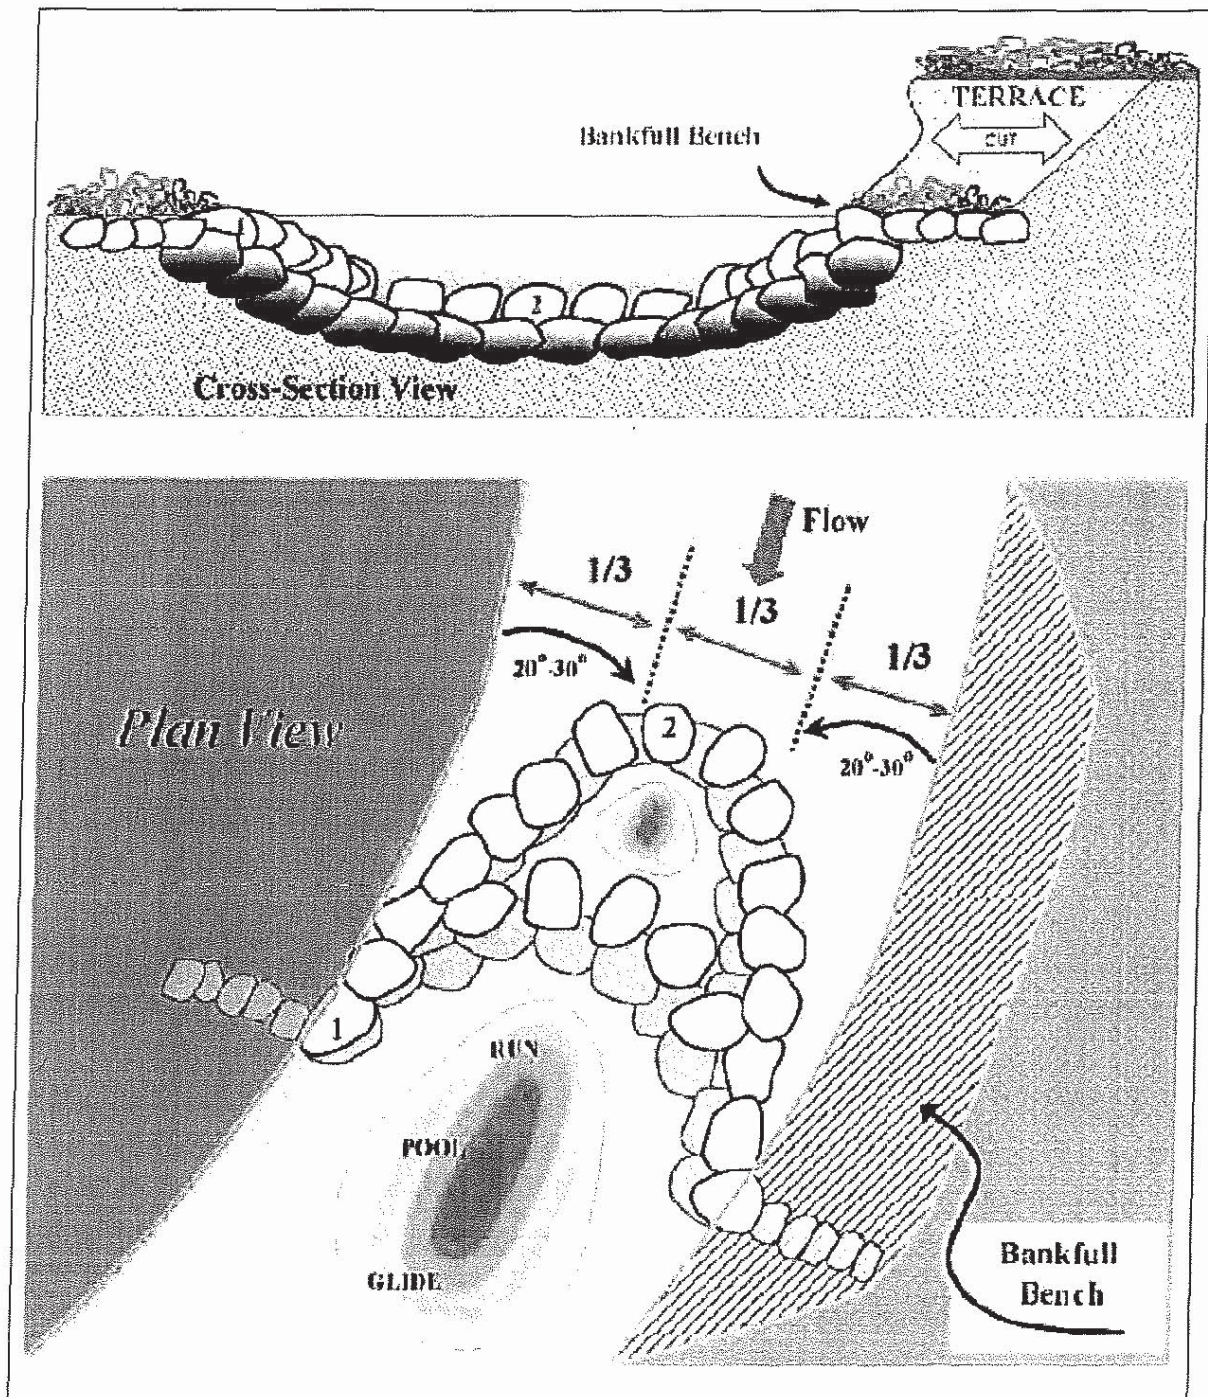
Boulder cross vane and constructed bankfull bench (NRCS, 2007).
